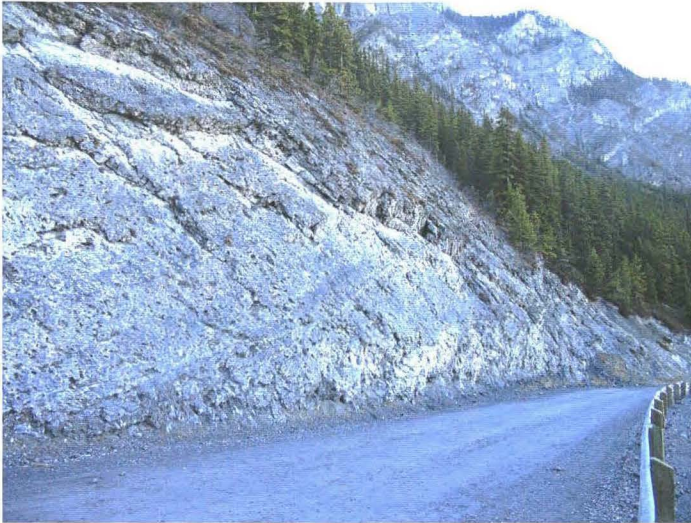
(top) – Typical cut slope between Km 5.5 and Km 5.8. The cut slopes are typically steeper than 60° and expose limestone with bedding that dips into the slope, which is favorable with respect to slope stability. However, there is a set of sheet joints perpendicular to the bedding that dips down towards the road at around 40° , effectively creating an overdip slope along this segment of the highway. Also note the narrow road and lack of a ditch along the toe of the cut slope.
